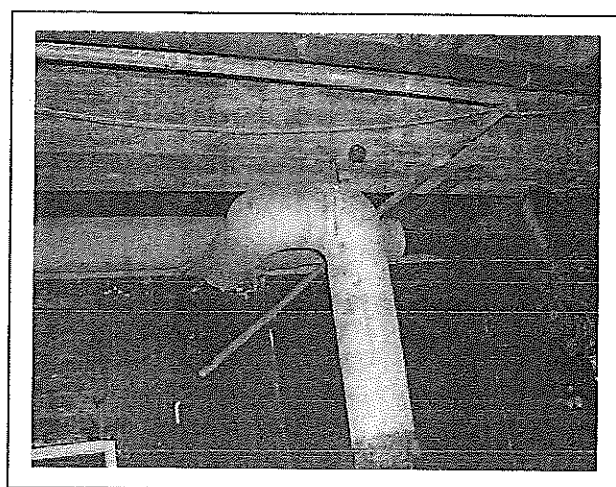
Viewing 8" pipe insulation, Attic mechanical room.
